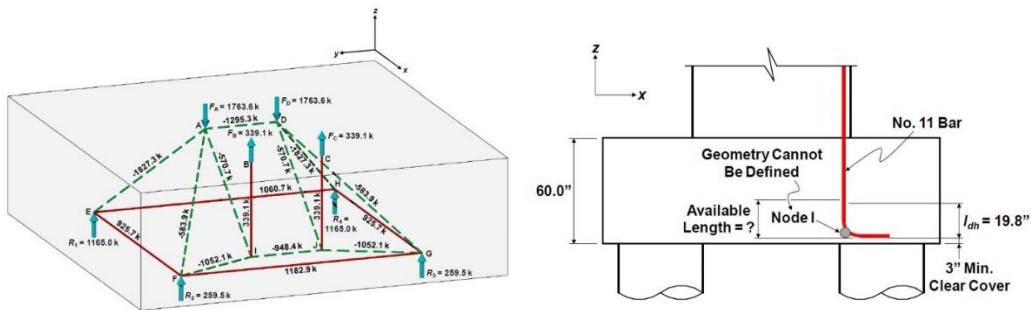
Strut-and-tie model resulting in tension at column section (left) and suggested anchorage detail of column reinforcement (right) (Williams et al., 2012)
